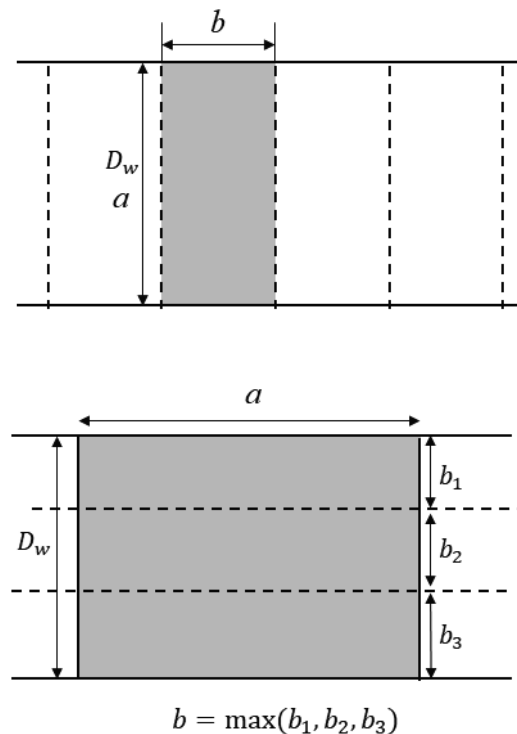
Parameter Settings for an Opening Reinforced by Stiffeners in the Girder Span Direction
